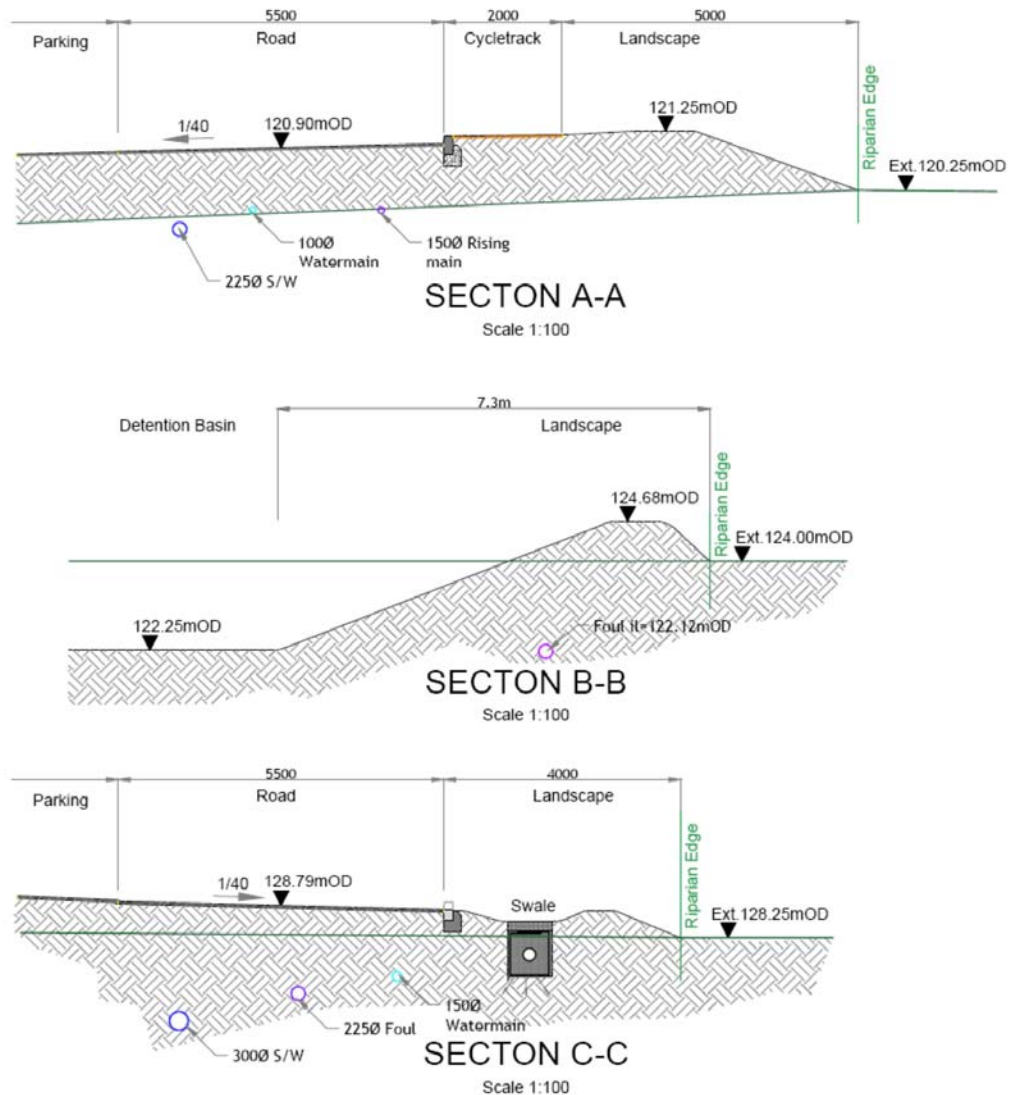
Extract from RMA Dwg.1324/402 - Sections showing raised embankment to east
